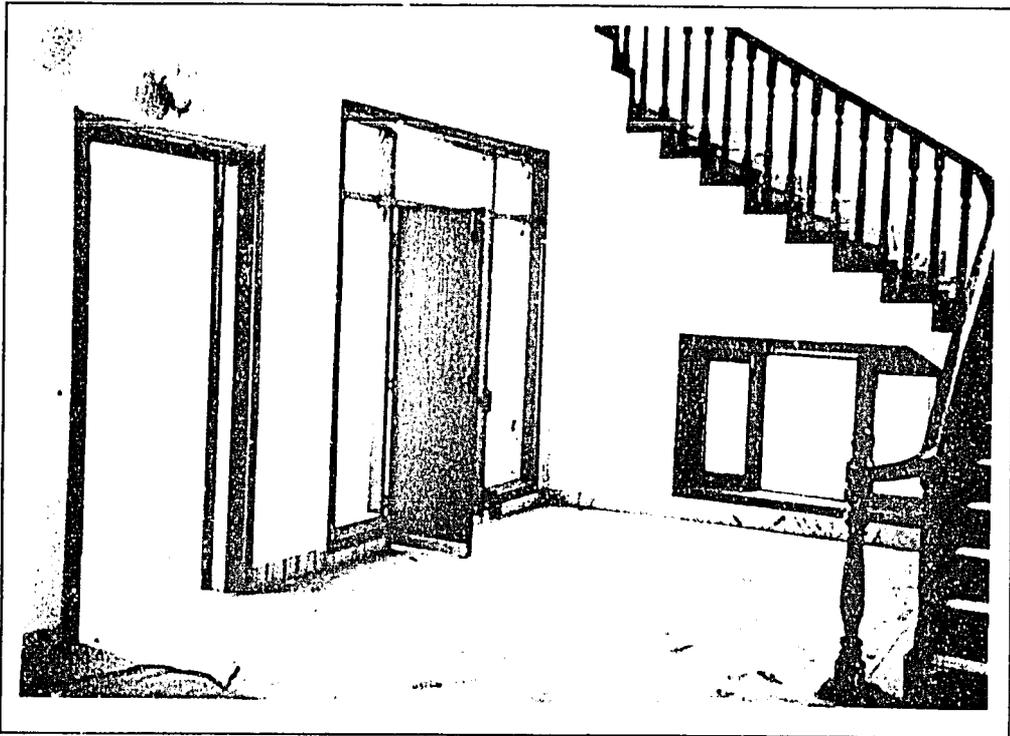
Peshawar HRD Office Facility. East End of Building, Main Entrance.
